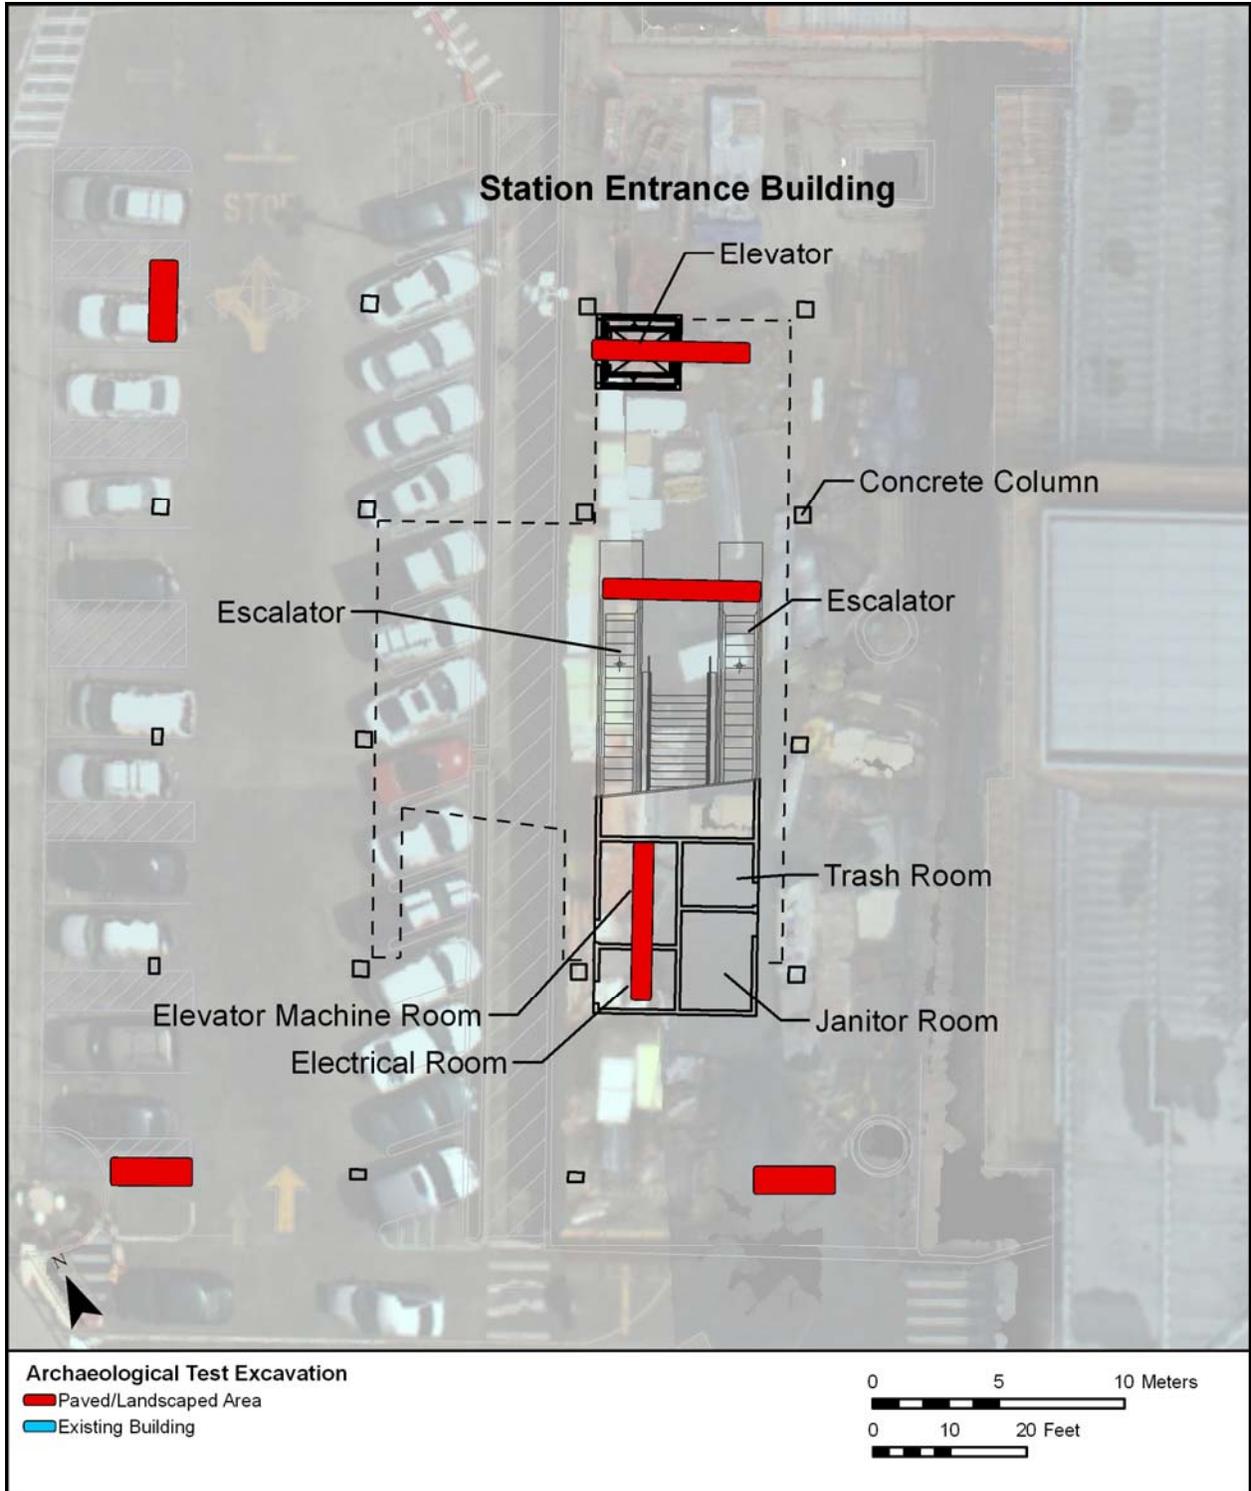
Ala Moana Center Station, detail of (*makai*) Station Entrance Building foundation layout showing proposed locations for archaeological inventory survey testing (three 2' by 20' and three 3' by 10' test trenches at *makai* Station Entrance Building
